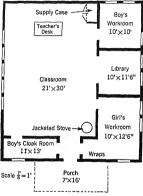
FIGURE II. PLAN B. FLOOR PLAN FOR A ONE-TEACHER SCHOOL.
